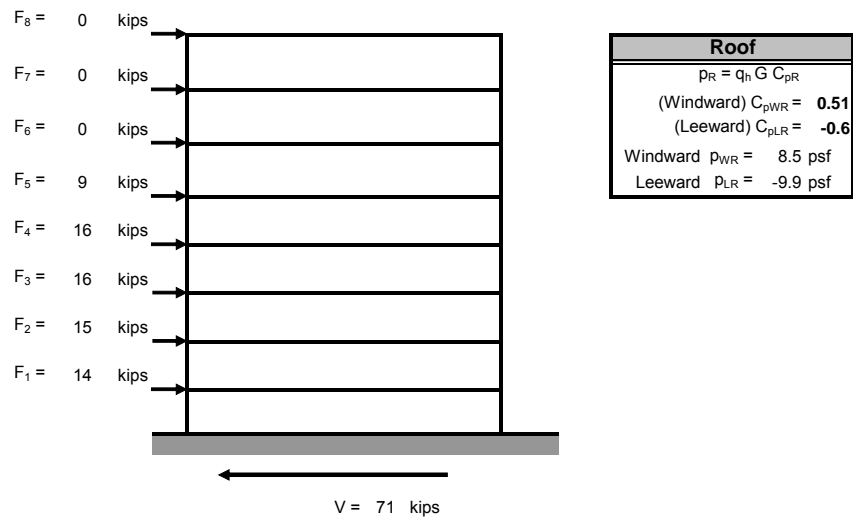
Wind Load Calculations for Staggered Truss System, NS Direction
